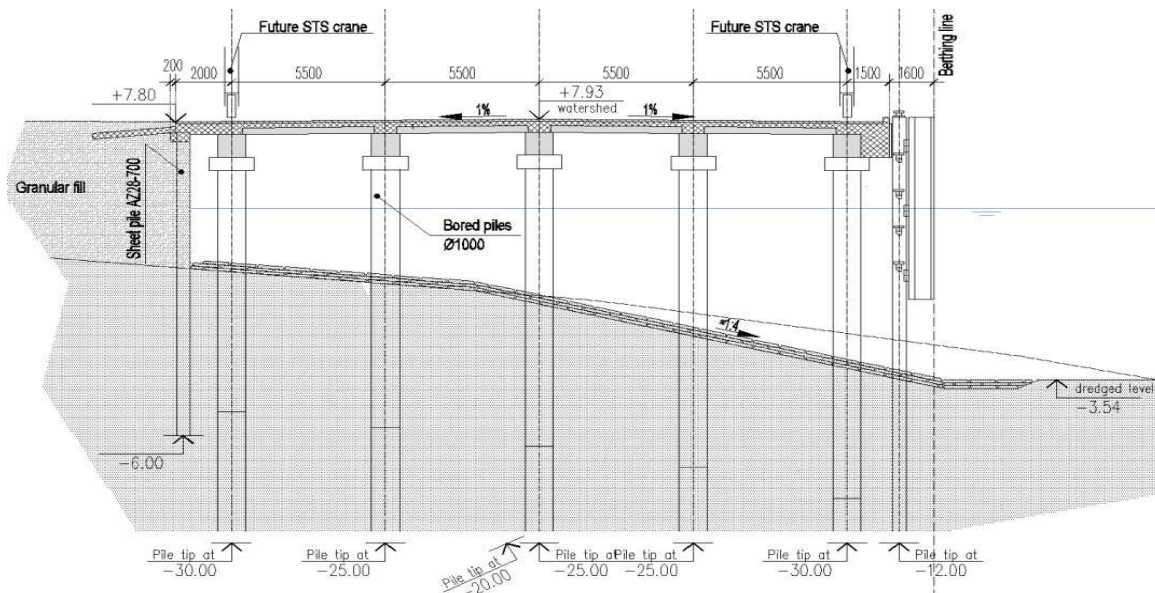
Typical Cross Section of Pangaon Suspended Deck Structure
